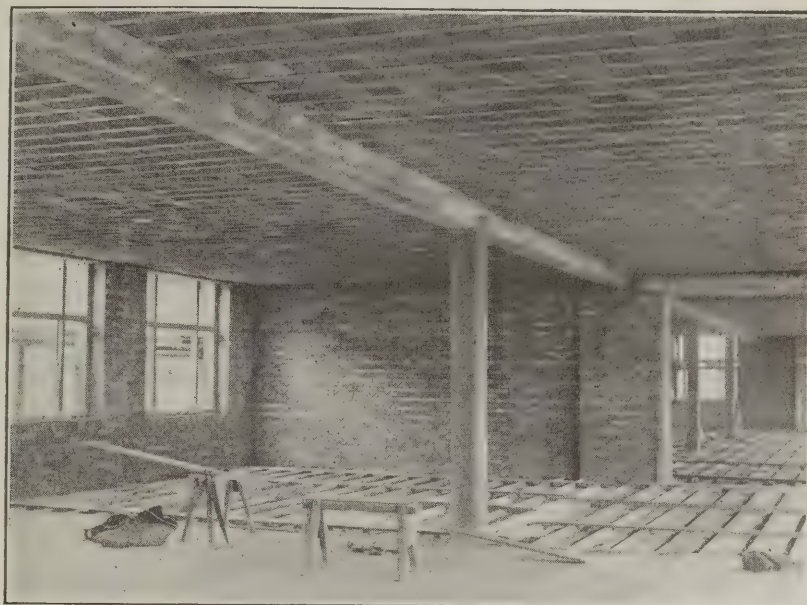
VIEW SHOWING SOFFIT OF FLOOR (21-FT. SPAN).
